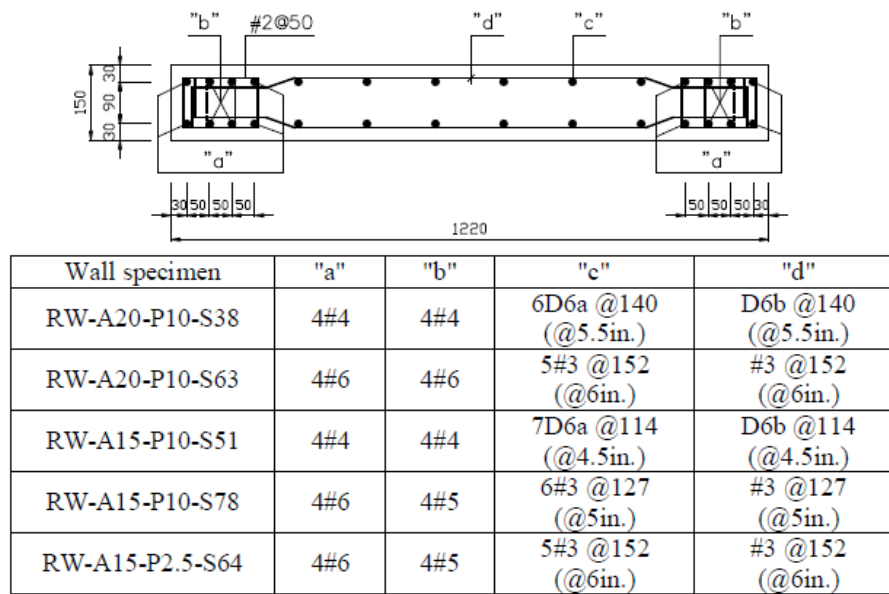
Wall Reinforcement Details (Tran and Wallace, 2015)
